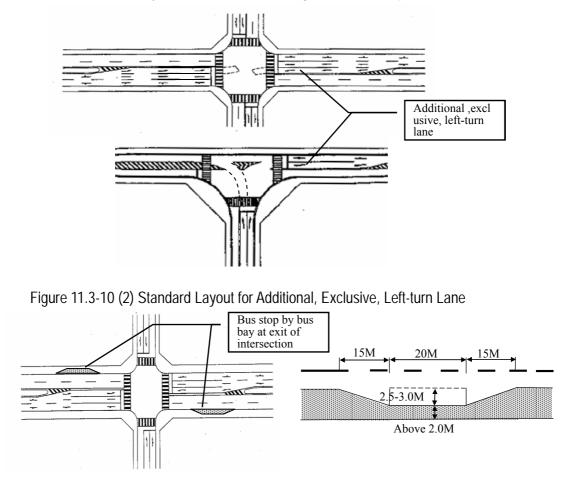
(3) Standard Layout for Improvement of Bus Stop Location
